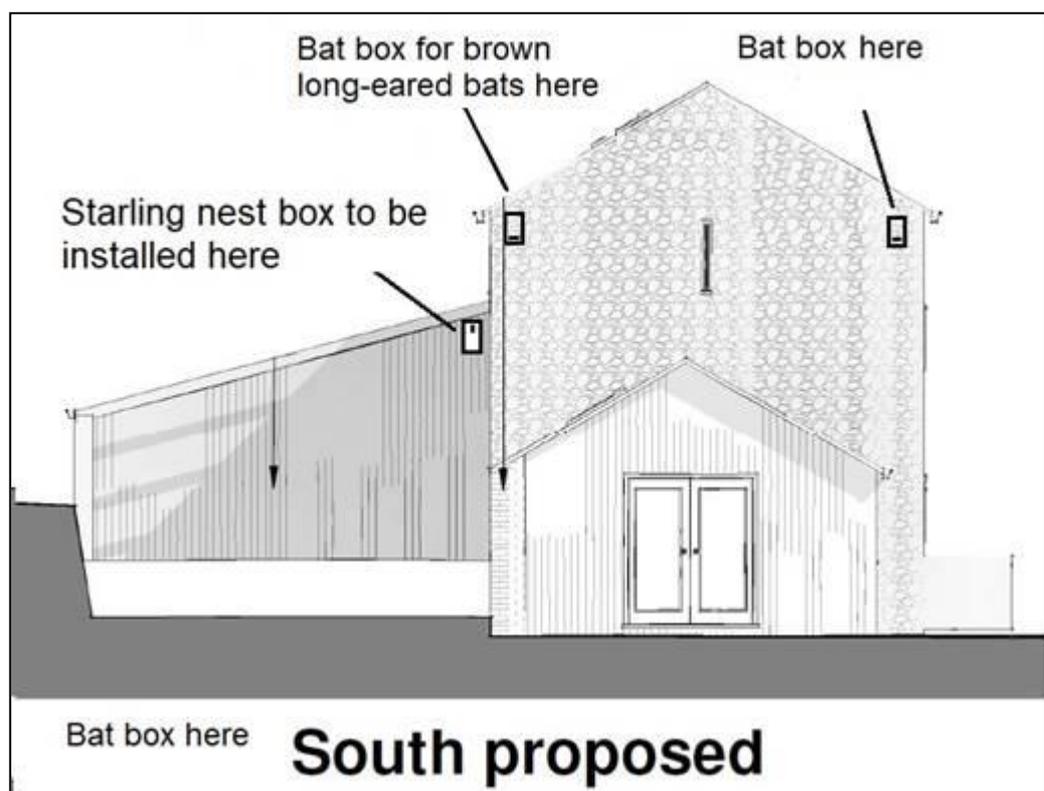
South gable elevation showing position of starling box and compensatory bat boxes
